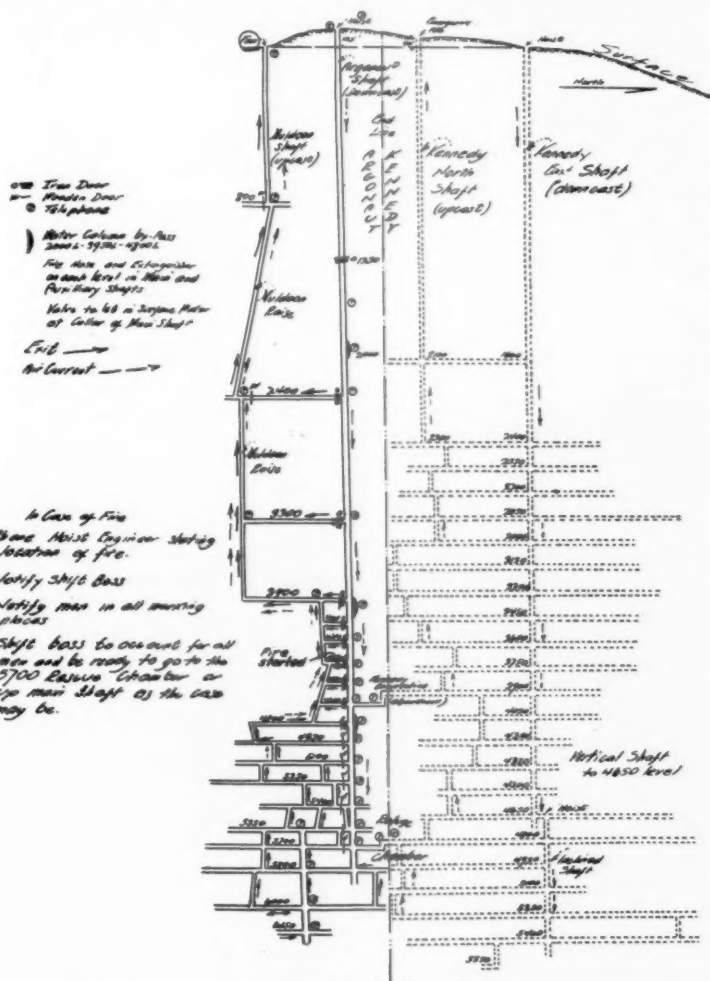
Vertical section of Argonaut mine, showing ventilation and connection with workings of Kennedy mine. Fire protection plan posted on each level shown at left
